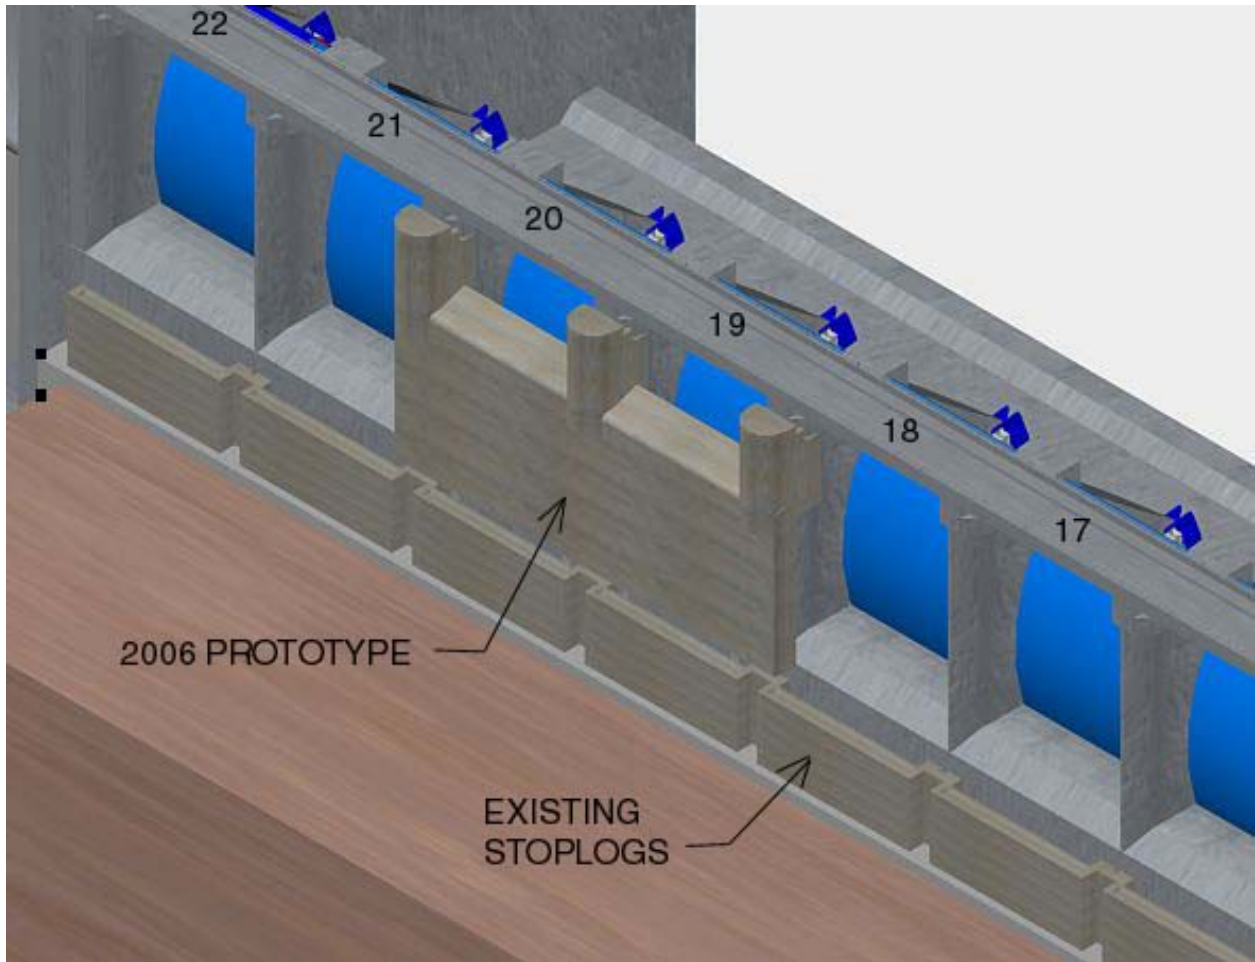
Schematic drawing of the Priest Rapids Dam top-spill prototype bulkhead, installed at Spill Bays 19 and 20, near the junction of the spillway and powerhouse.
